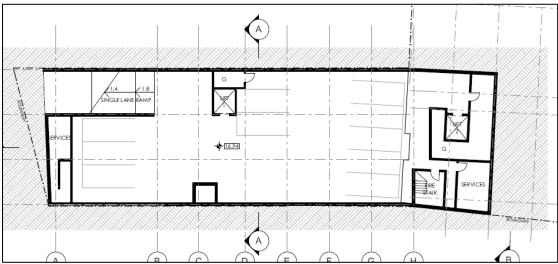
Proposed basement plan. (Source: PTI Architecture Pty Ltd)
